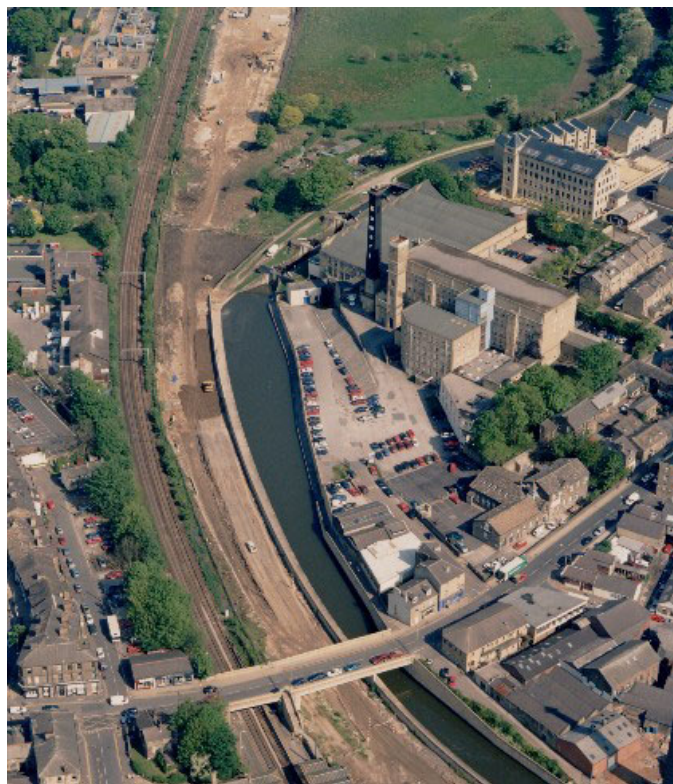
An aerial view showing the canal, 'wall', proposed road earthworks and railway line.
